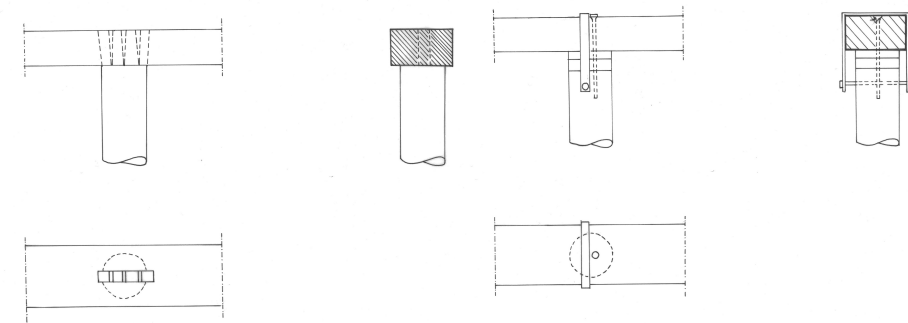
Connection type: mortise-tenon joint (left, wall section 4-1), steel pin - braced edition (right, wall section 3-1). Note the absence of the floor planks in this drawing.
